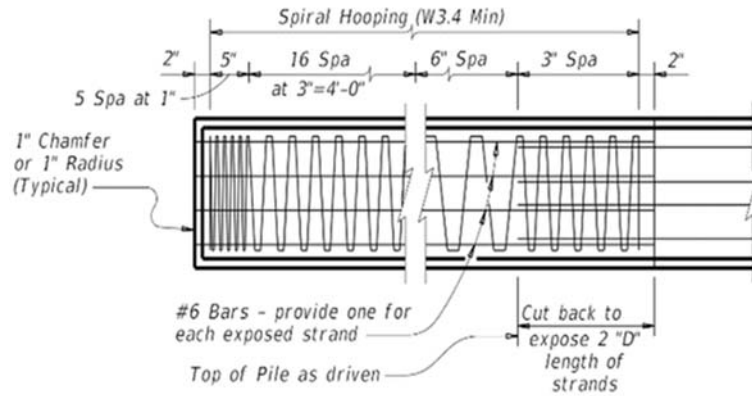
Current TxDOT Transverse Reinforcement Spec. for Prestressed Piling
